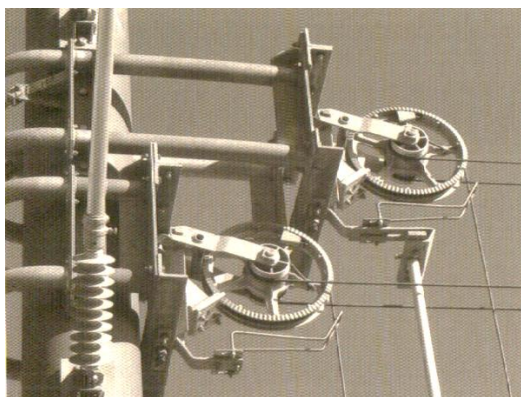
Wheel tensioning design with separate tensioning of contact wire and catenary wire
